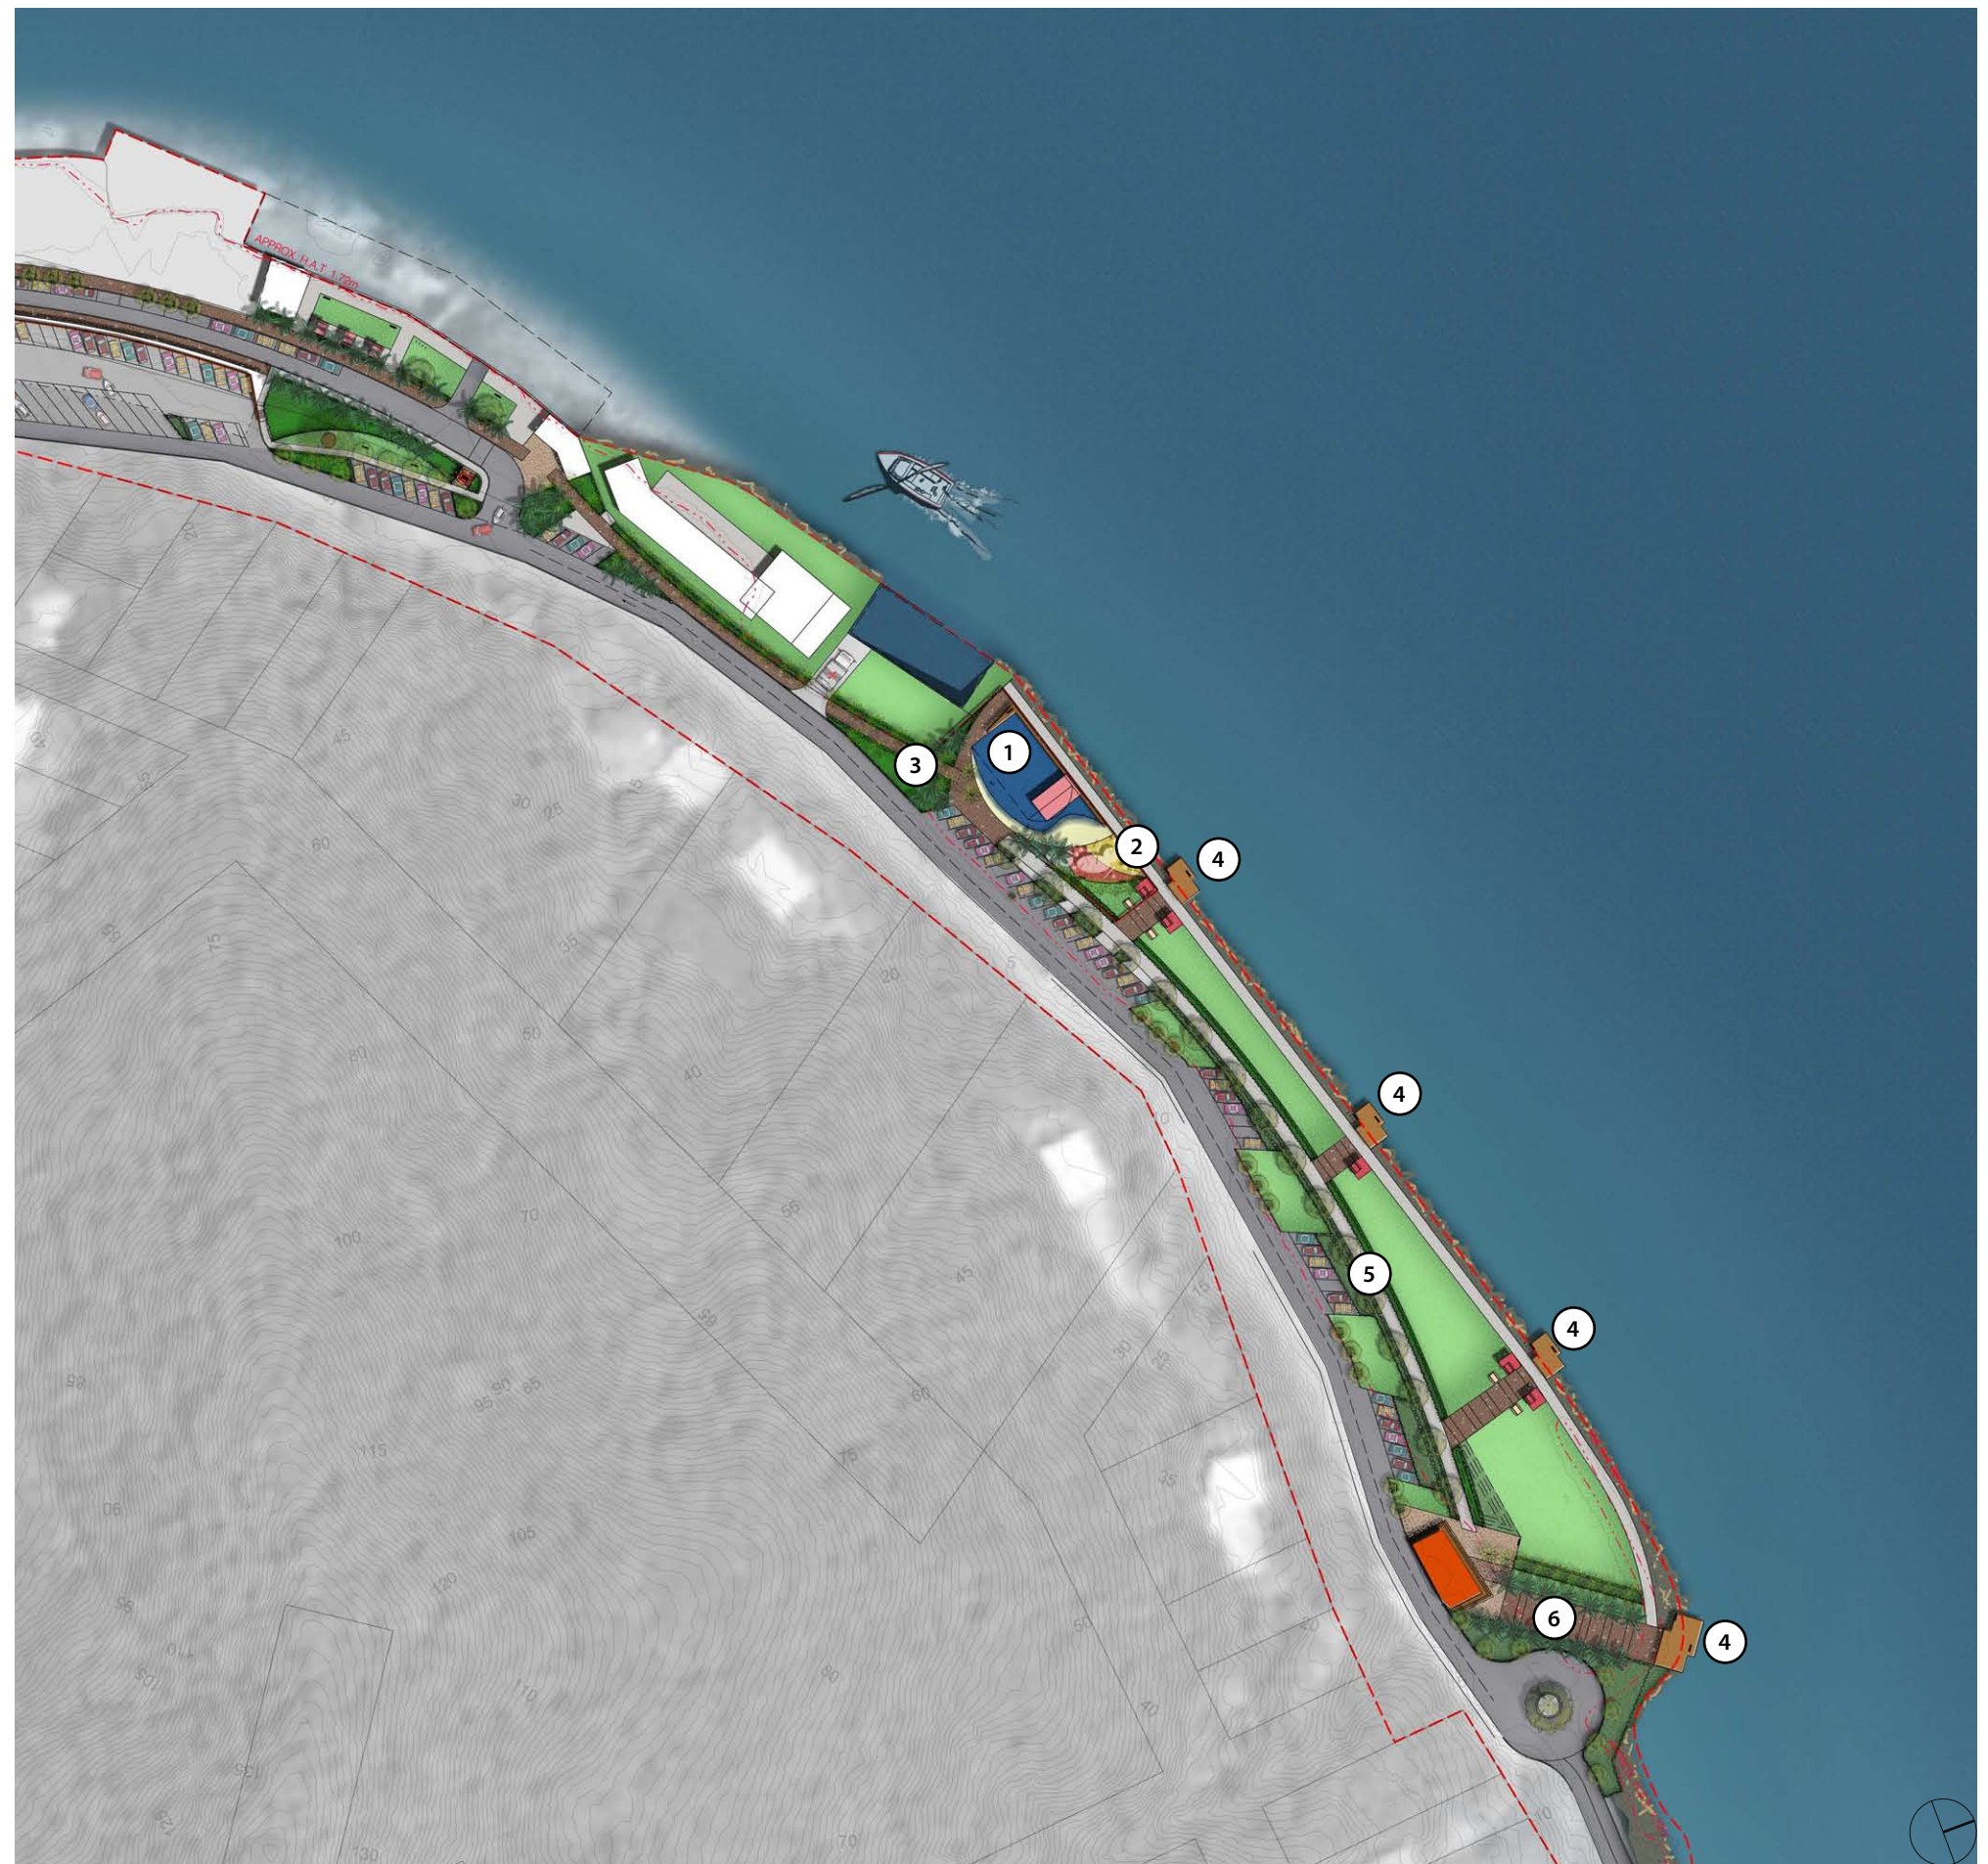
2000 @ A3 | The Master Plan, Hardscape, Activity Precinct Plan
